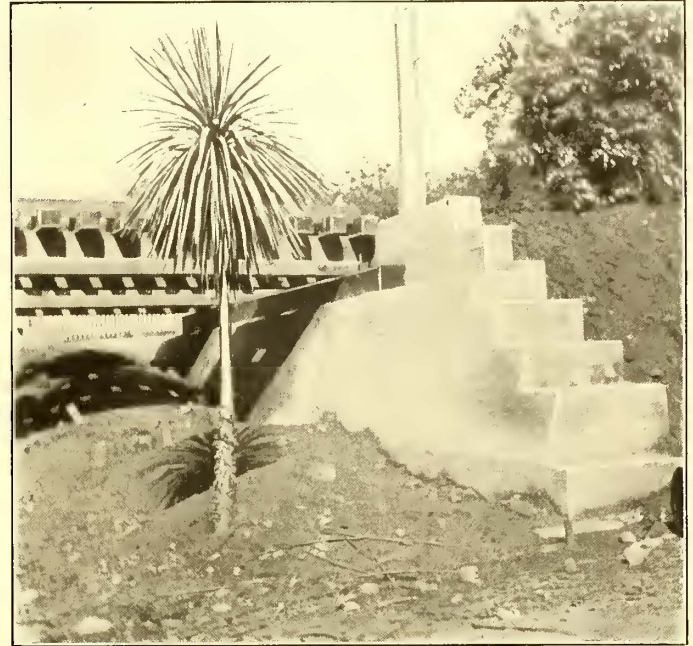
DETAIL, SHOWING STEPPED ABUTMENT OF CONCRETE PIER BRIDGE
